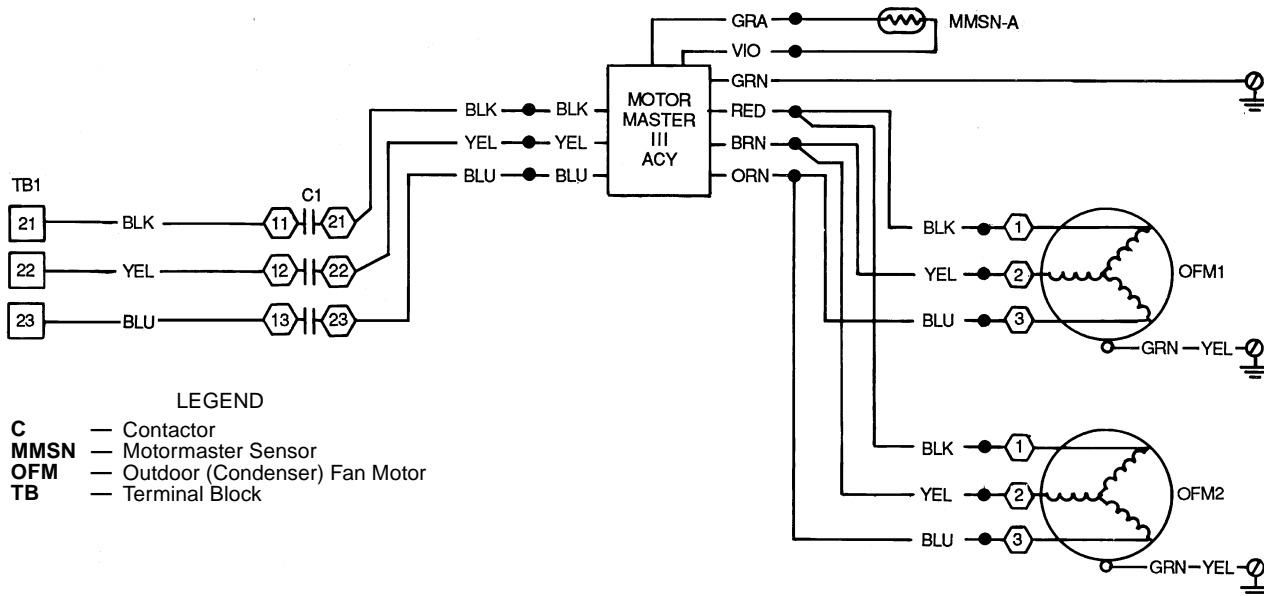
Motormaster III Control Wiring — 380/415-3-50 and 460-3-60 Units
